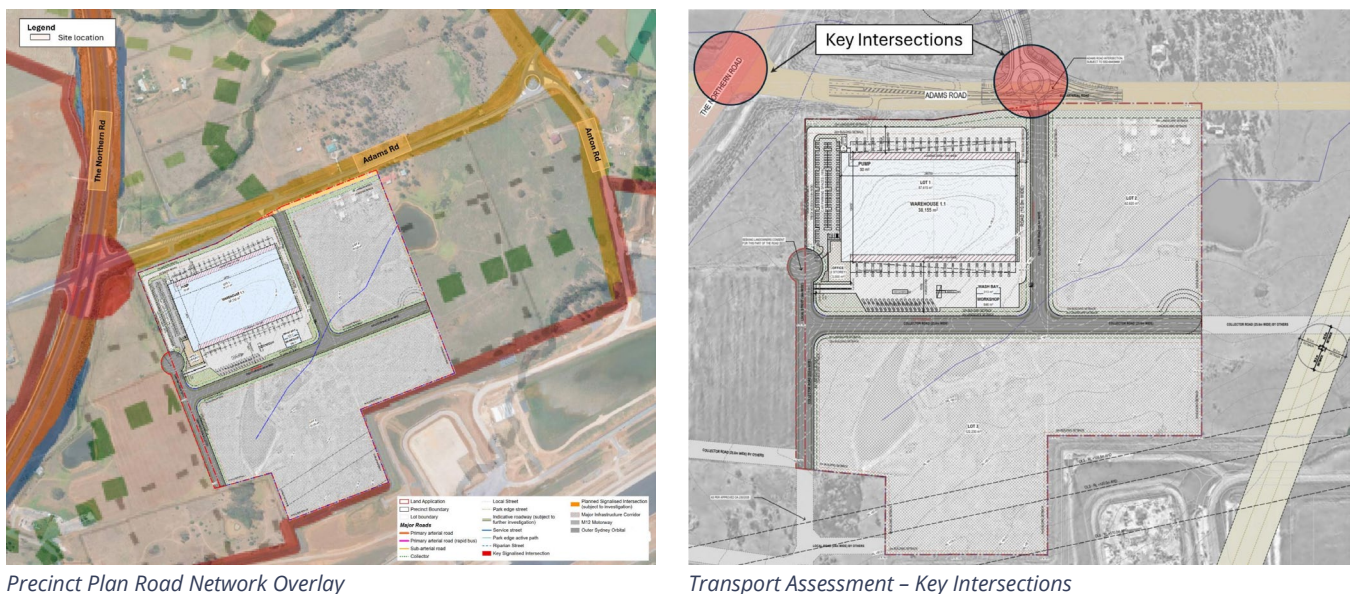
Preliminary Road Network – Precinct Plan Overlay and Key Intersections
